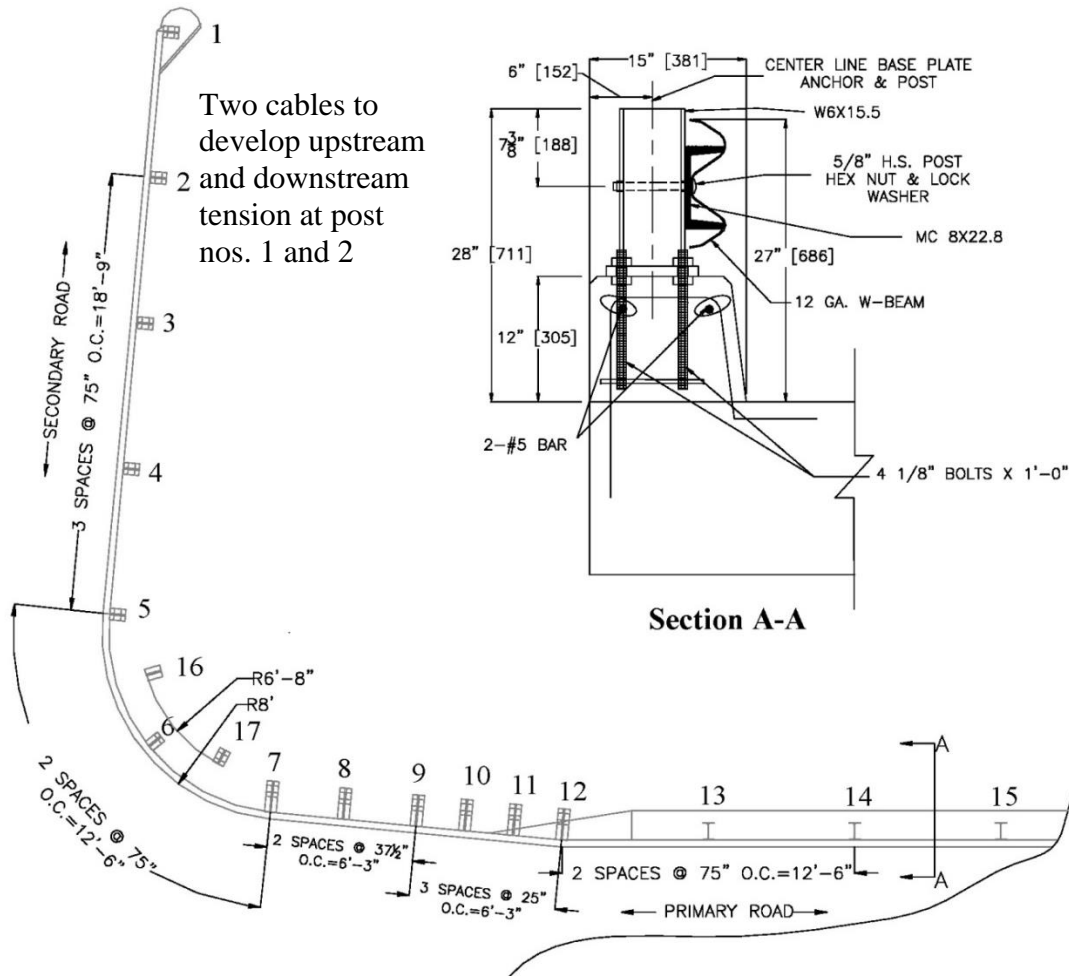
Yuma County Short-Radius Guardrail System – Final Details [6, 28]
